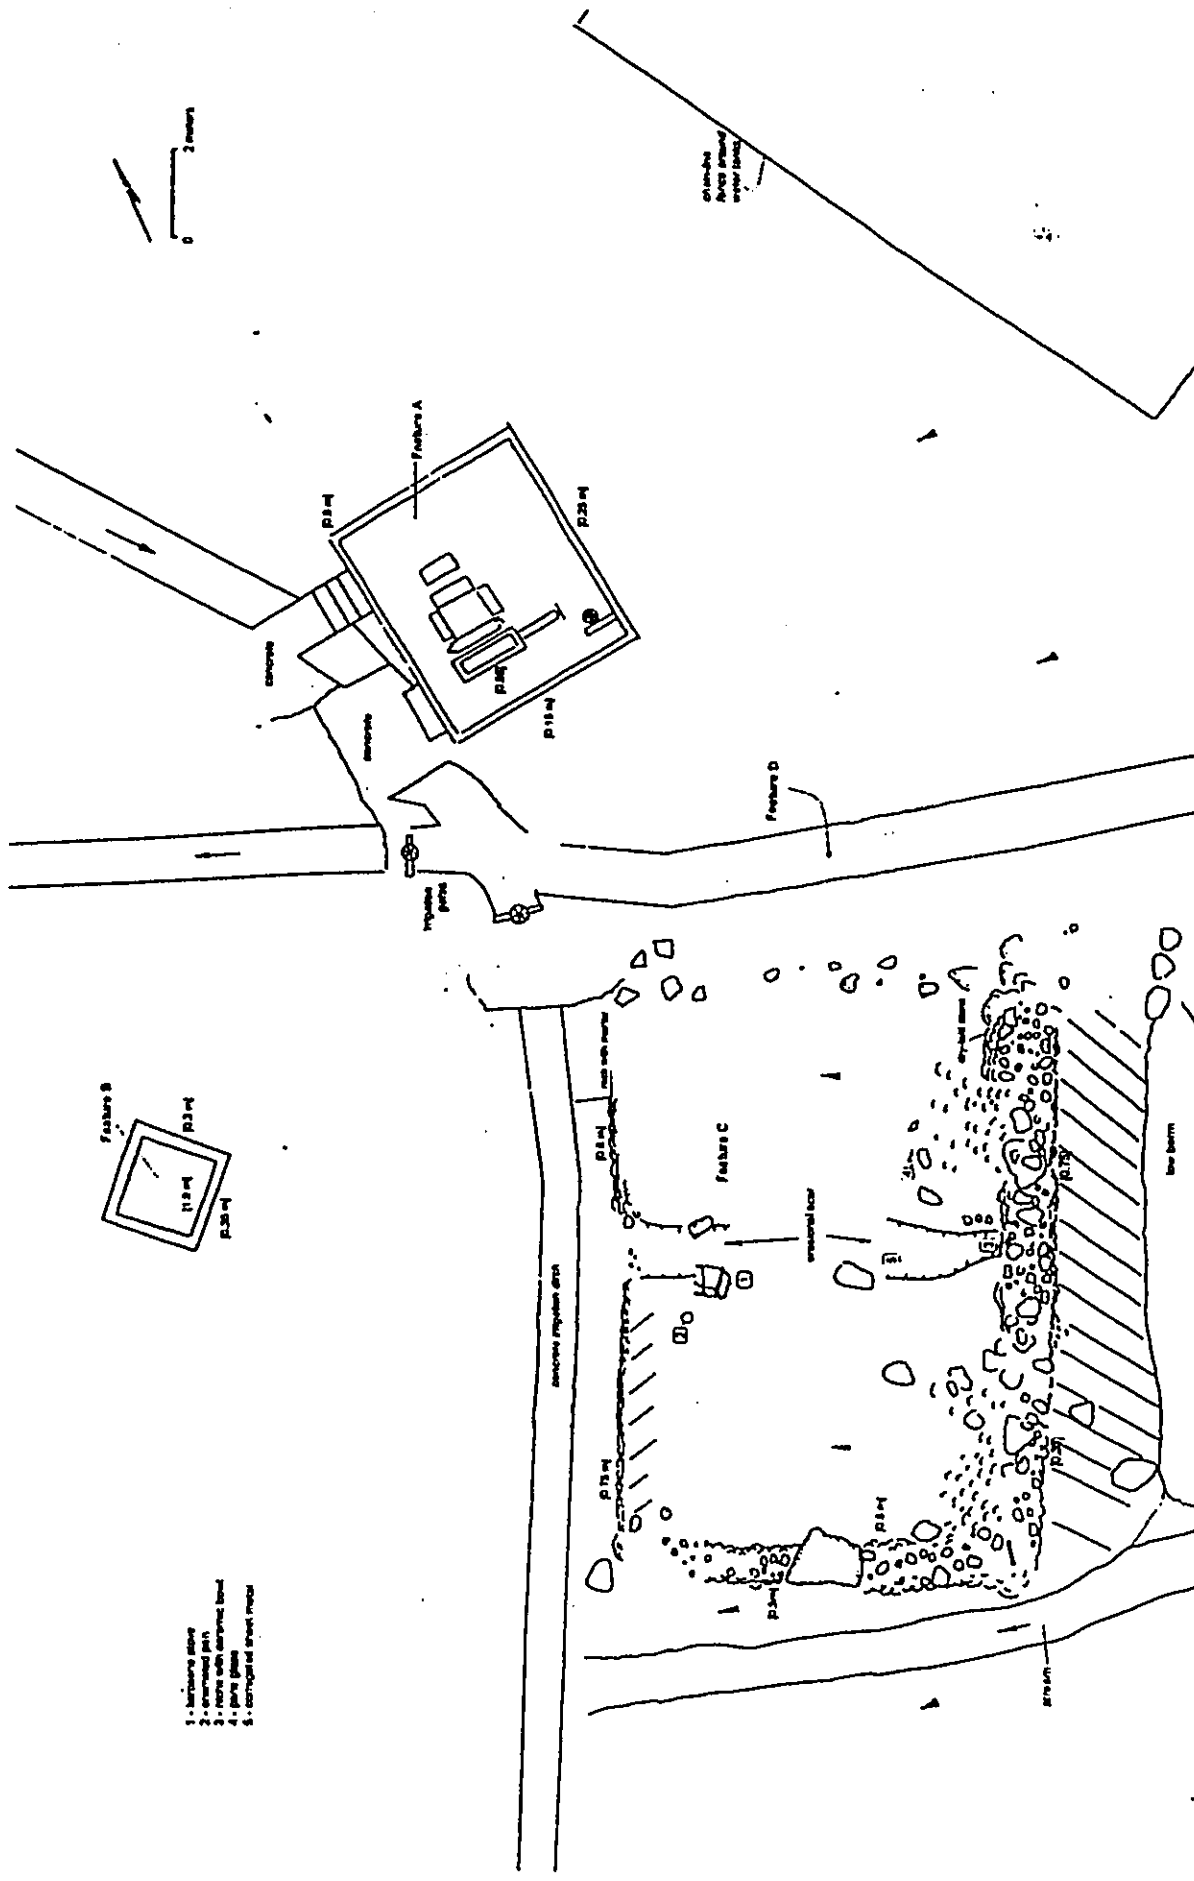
Plan view of Features A, B, and C—Site 4709.
